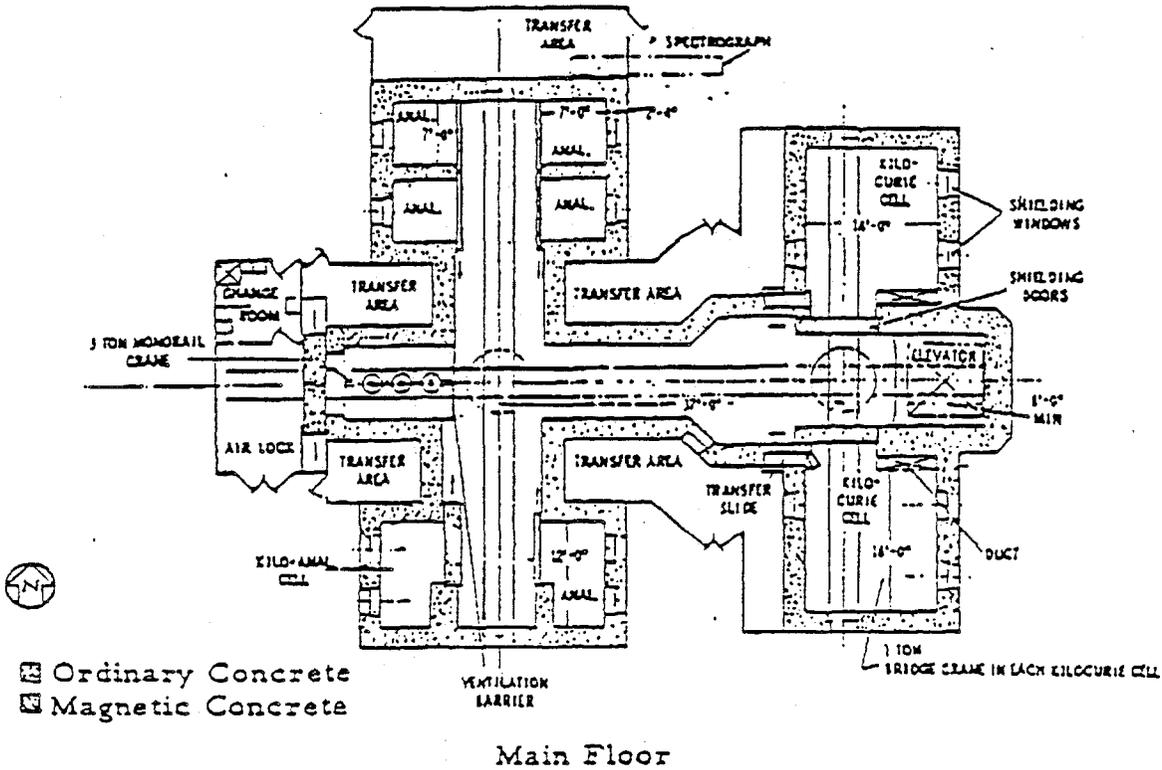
Floor Plan of Cave Complex in Shielded-Cell Facility
